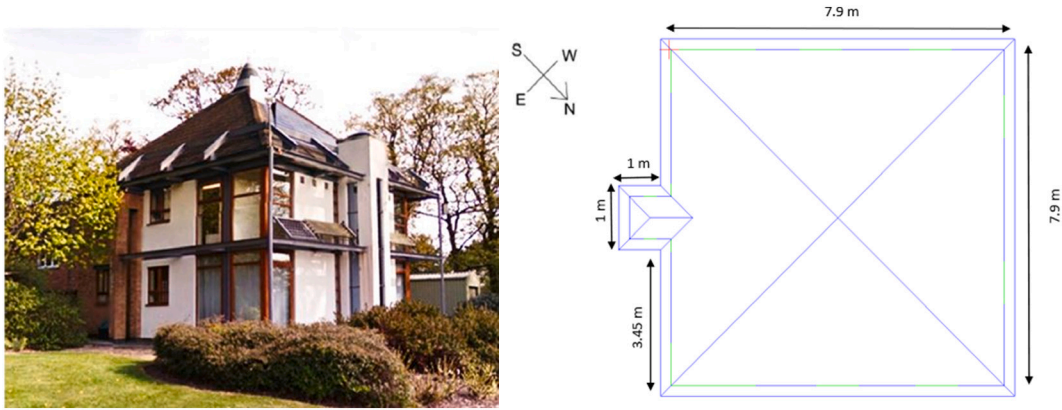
The David Wilson Eco-house (left) and floor layout (right).
